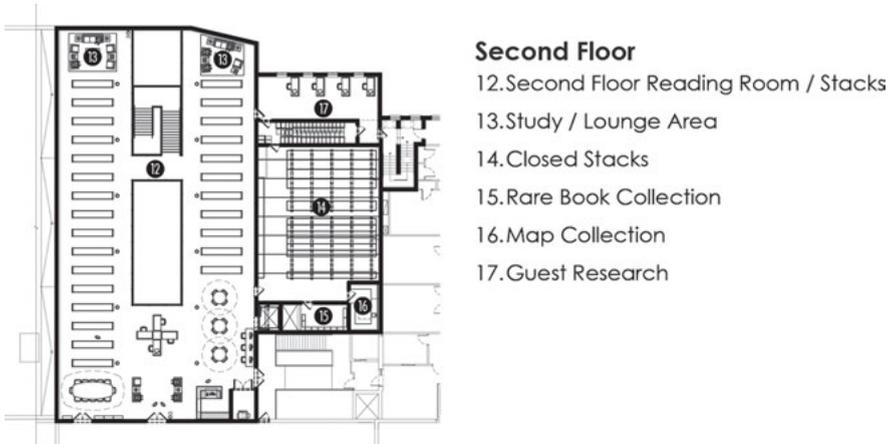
Second floor plan. © Pieper O'Brien Herr Architects.
